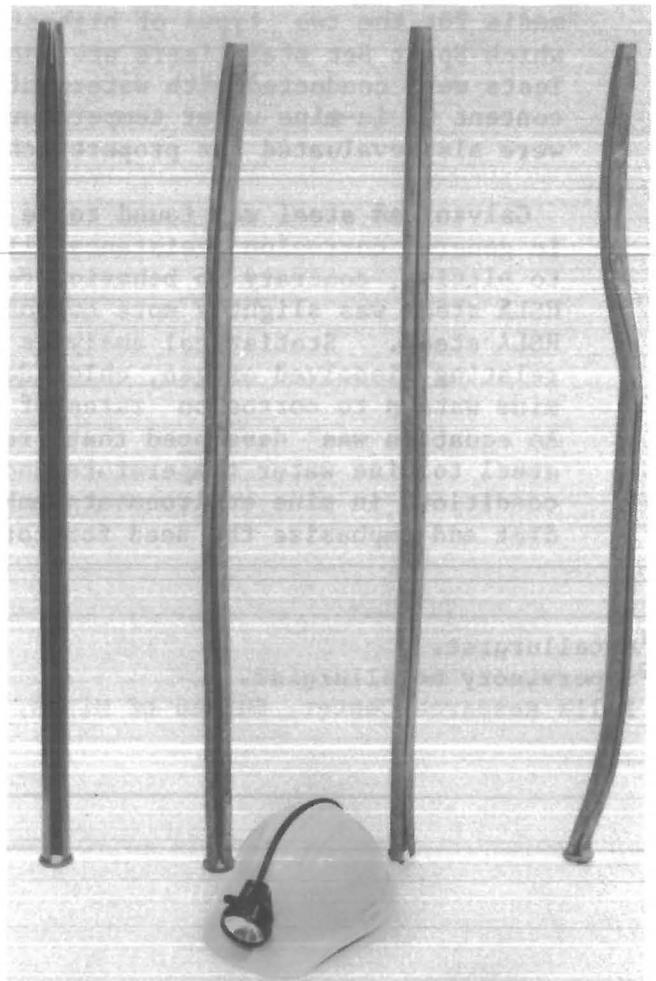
New 4-ft Split Set stabilizer (left) and three Split Set stabilizers retrieved after use in mine roof support.
